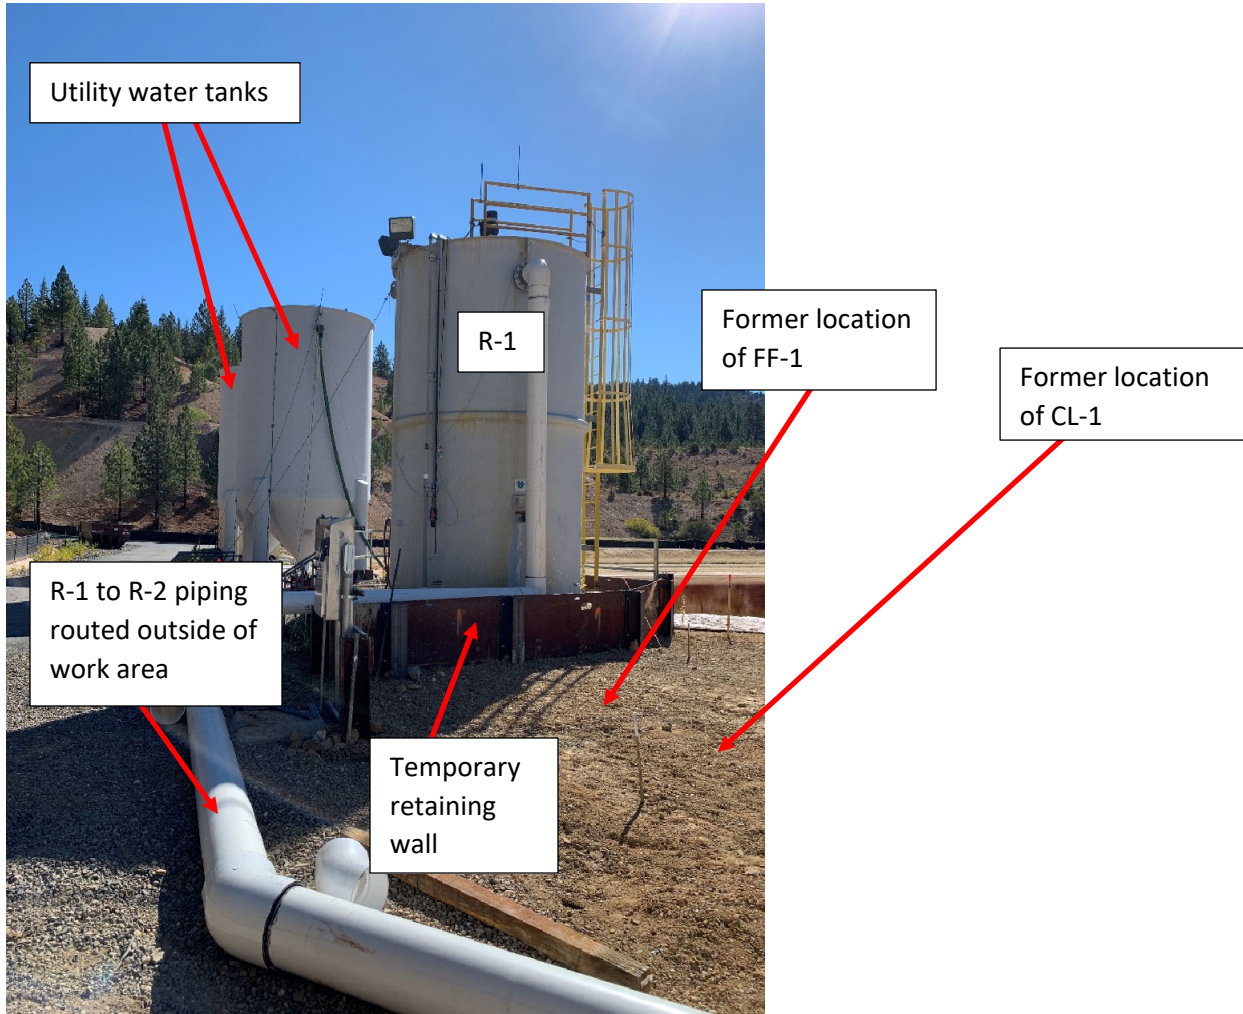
October 5, 2022, Pond water treatment reconfiguration activities underway, FF-1, CL-1, and portion of existing retaining wall removed. Temporary retaining wall installed near R-1.
